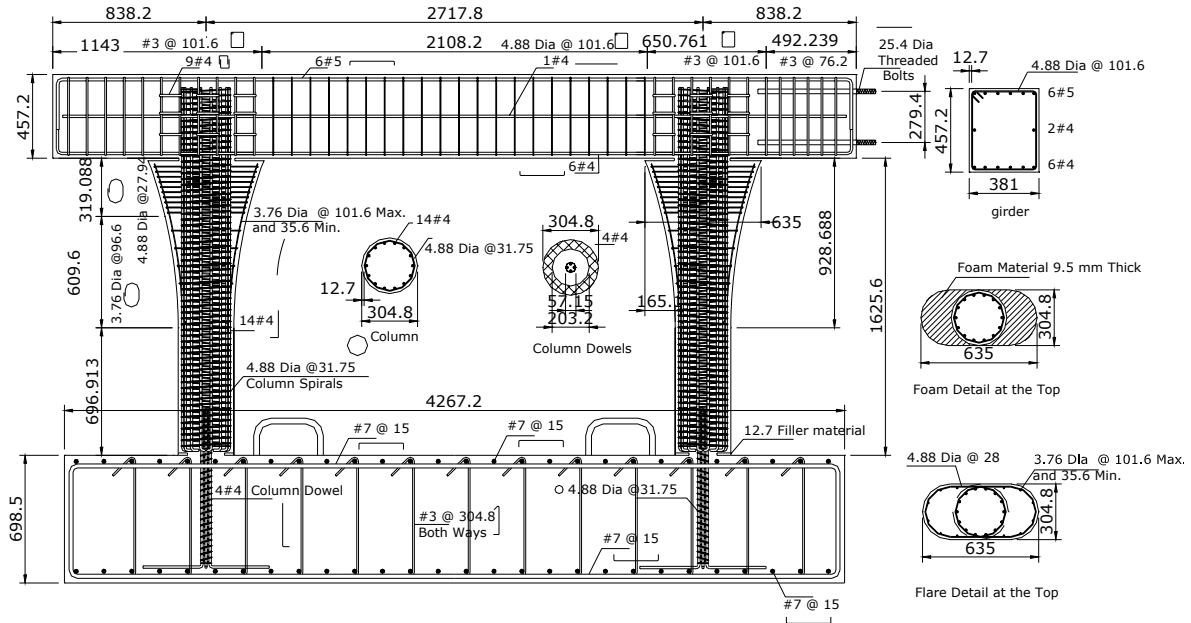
Specimen LFCD1 layout and reinforcement detailing
